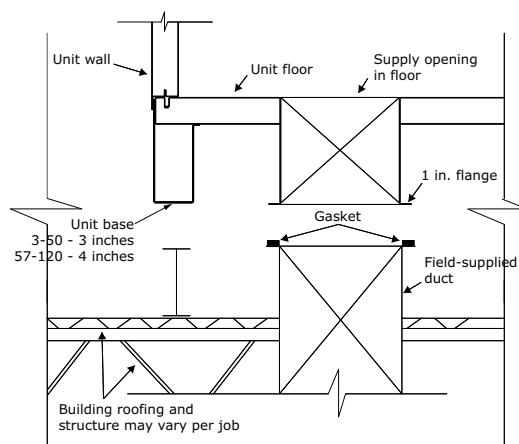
Field-supplied duct connection details - pier mount for outdoor units
